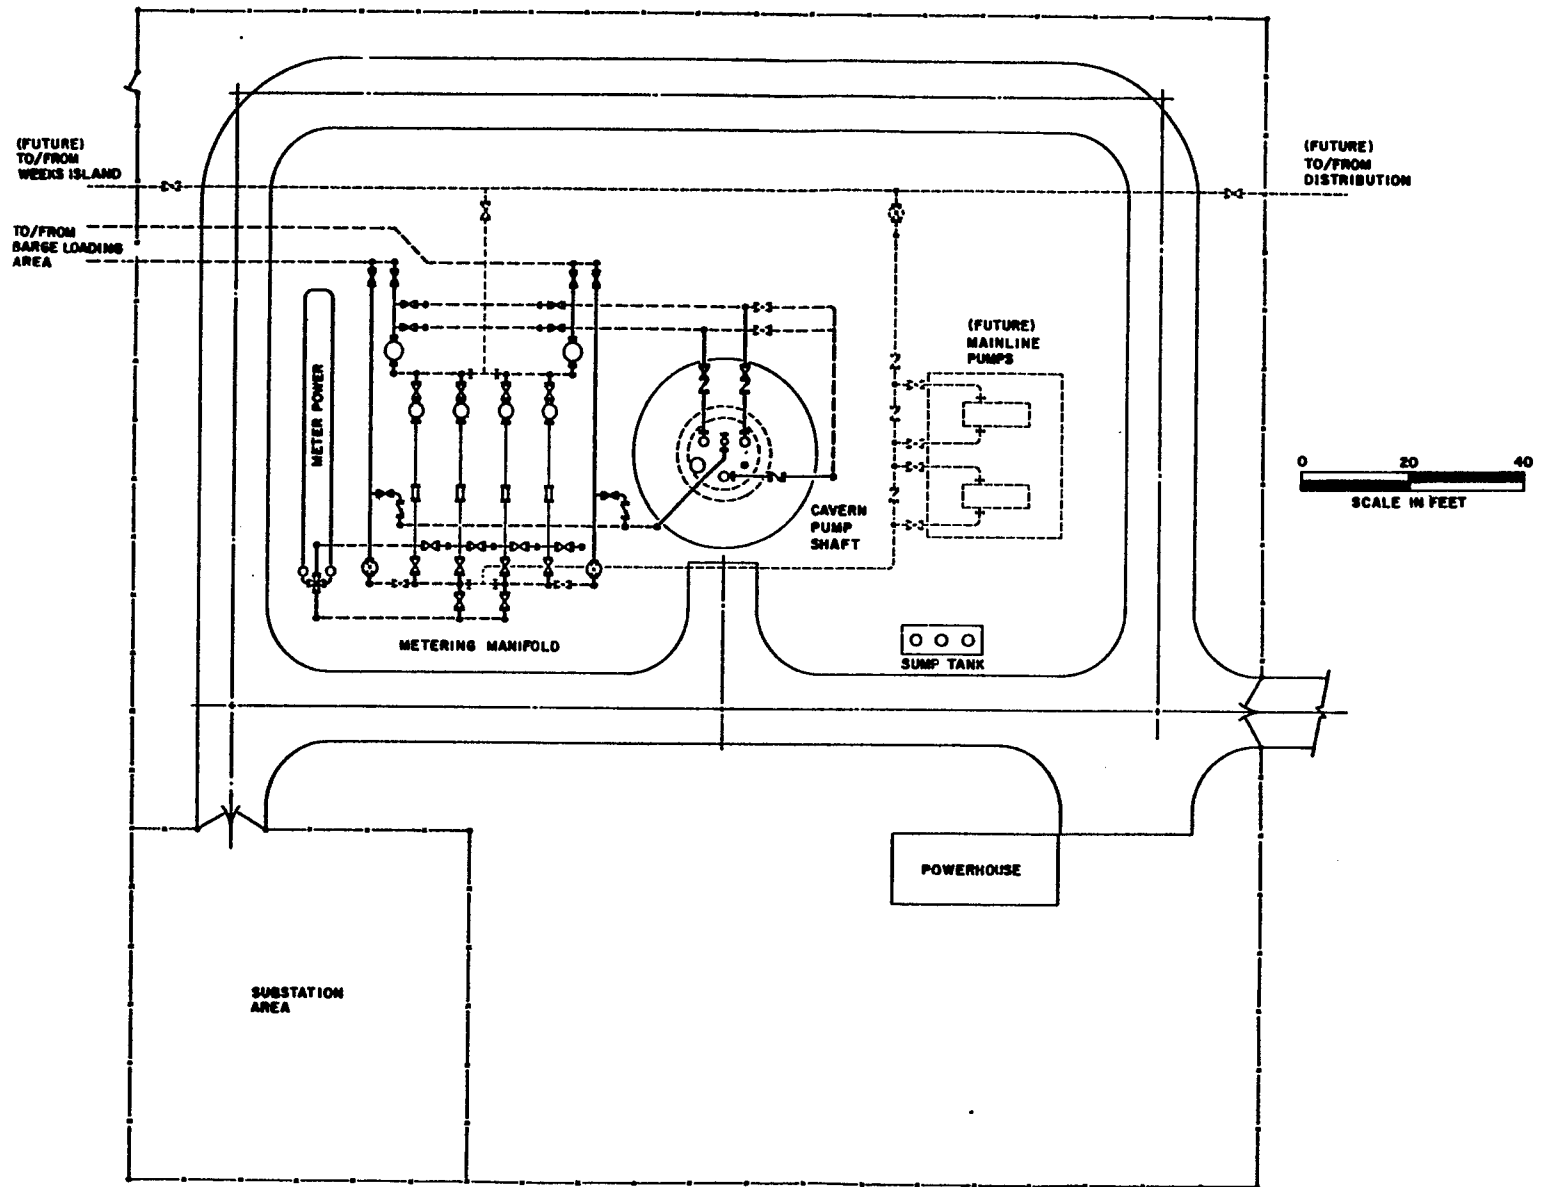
General arrangement plan. Storage site and pump shaft area, Cote Blanche system.
